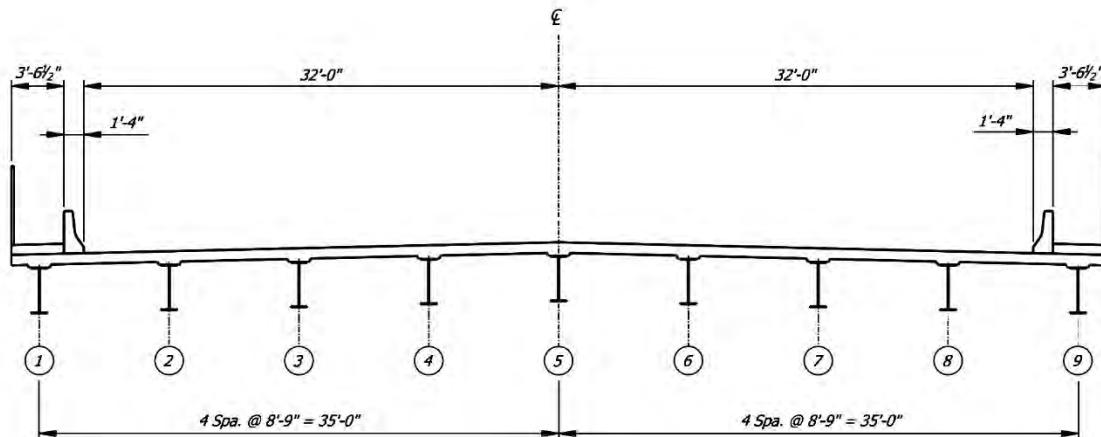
Cross-section view, looking north, indicating steel beam numbering in spans five to seven for Bridge Number 15558X. (Source: Missouri DOT)
